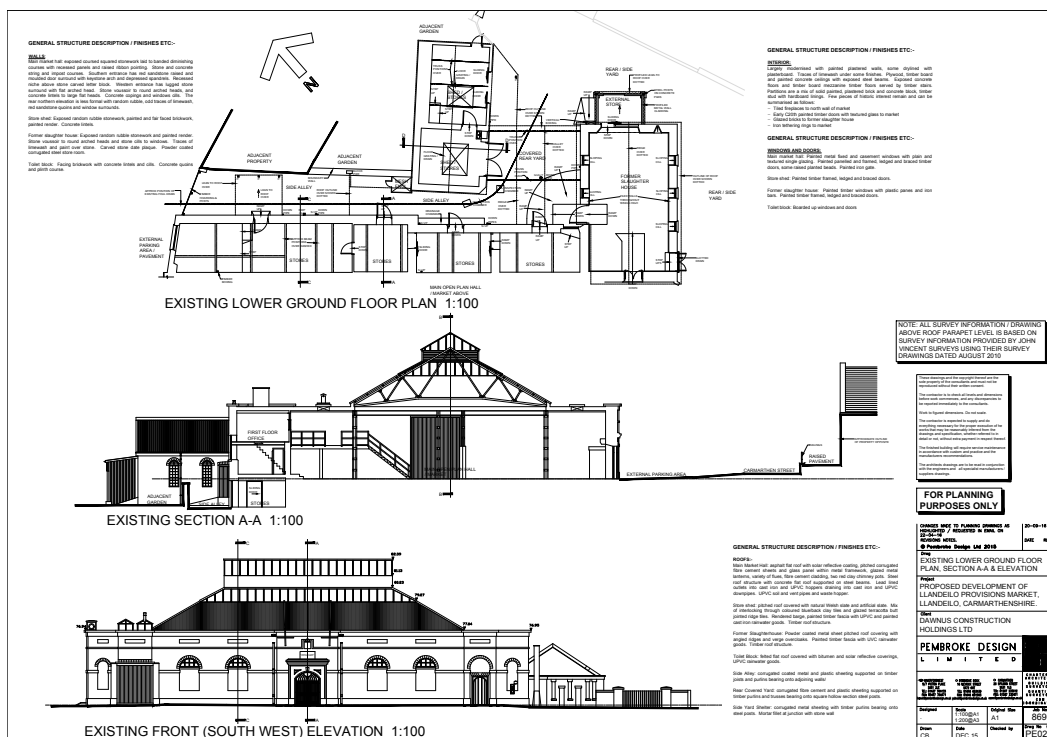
drawings as existing above: source - Pembroke Design Ltd
